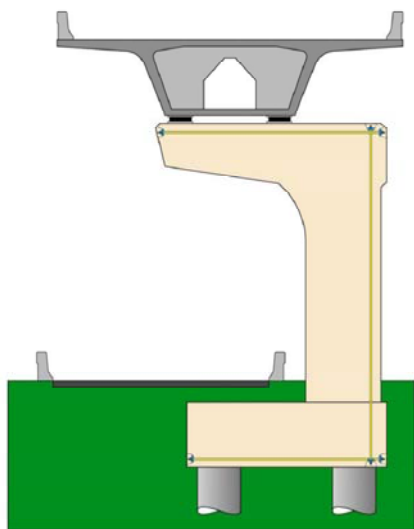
Post-Tensioning in Cantilever Piers.
